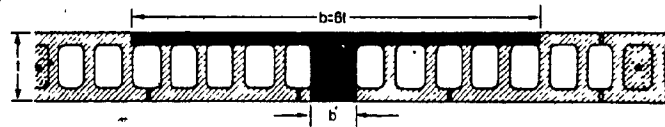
(b) — T-Beam Section Assumed in Flexural Compression (Masonry Laid in Running Bond).
